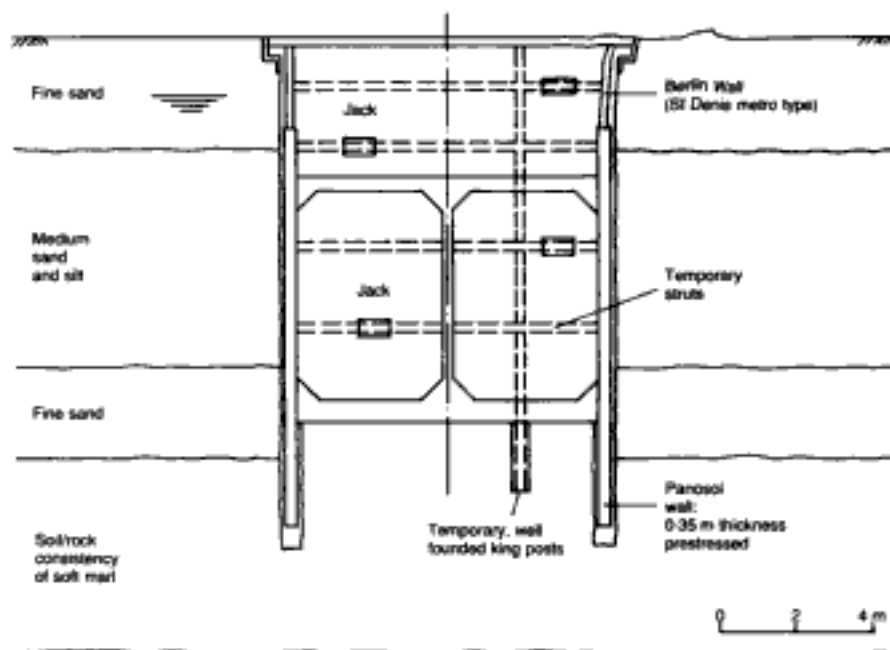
Composite Berlin wall with prestressed precast diaphragm wall, Fukuoka Metro, Japan (courtesy of Soletanche)
